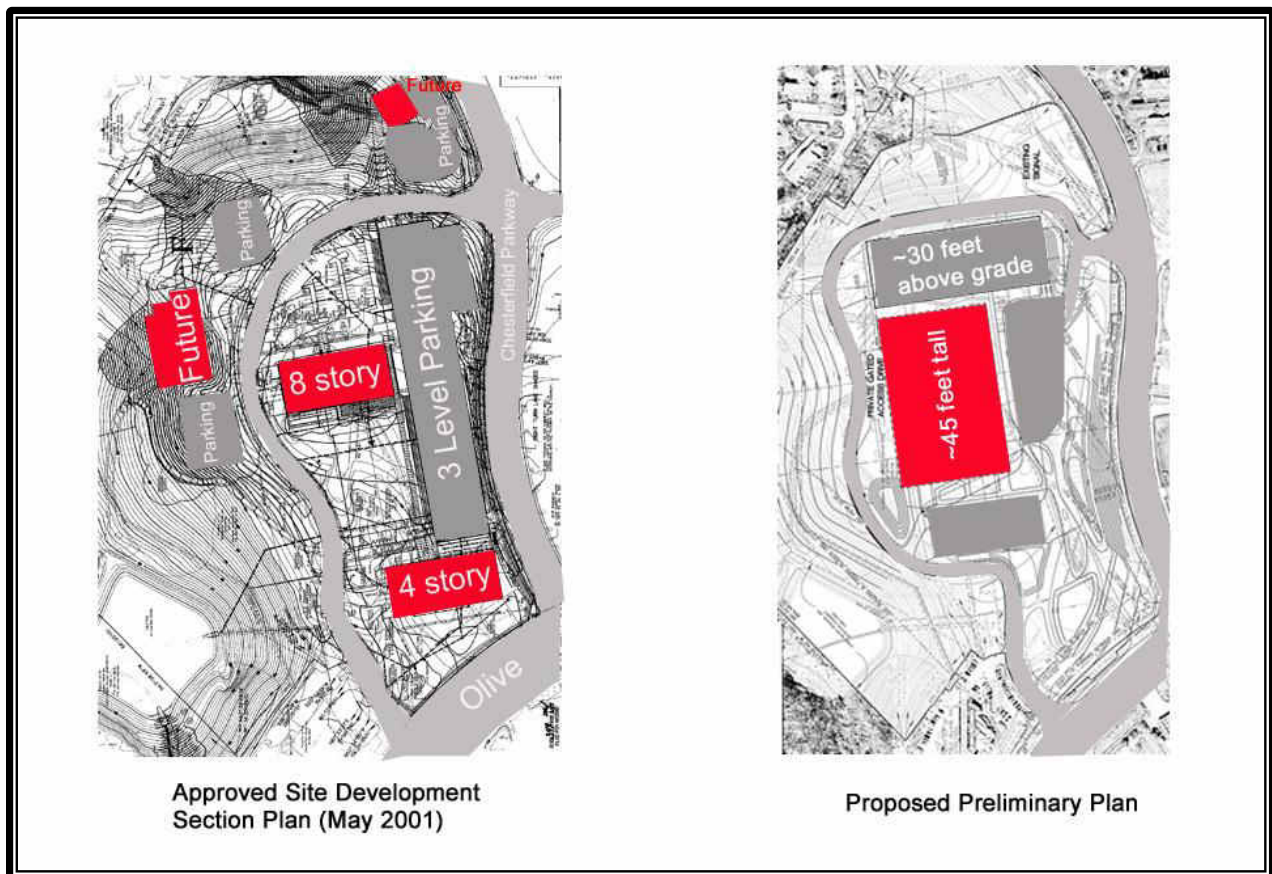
Spatial Comparison of Approved Section Plan and Proposed Preliminary Plan
